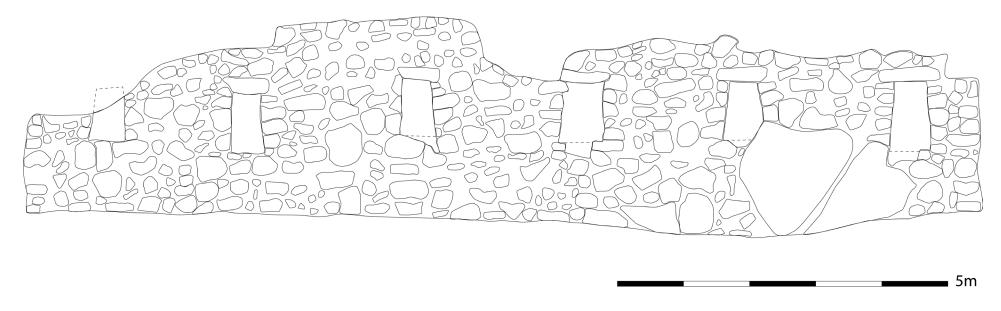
Inside elevation of the South wall of Building NC7, Kañaraqay
